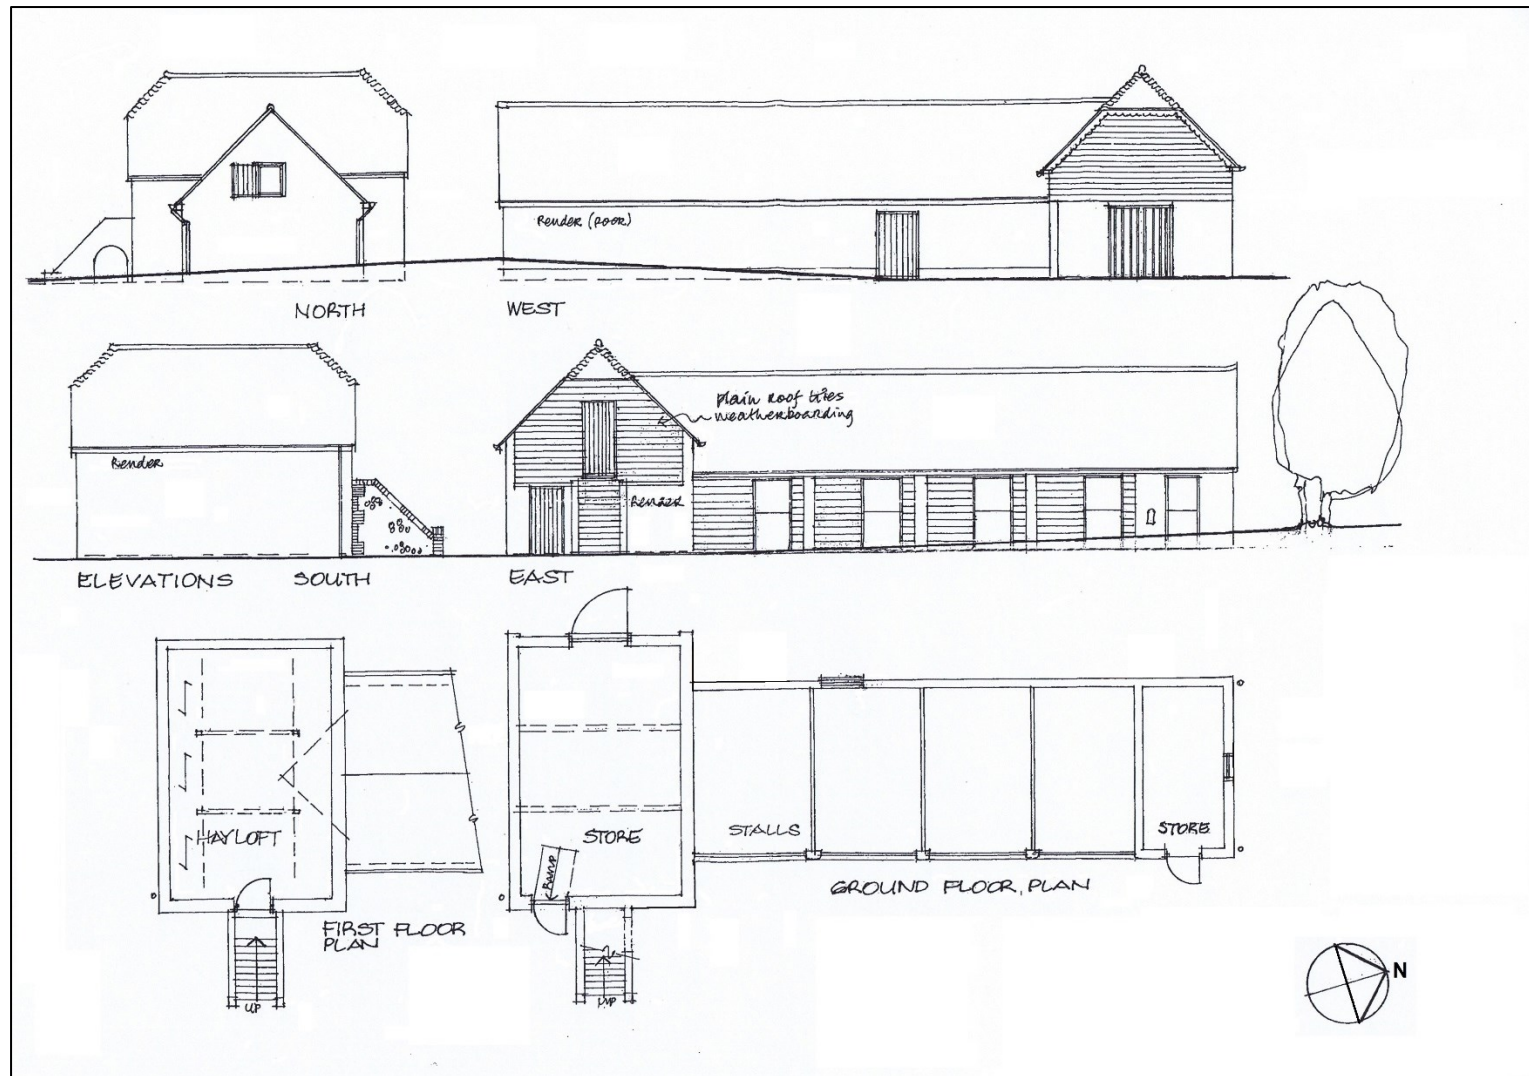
Hayreed Barn, Wilmington: Plans and elevations of existing building prior to conversion
